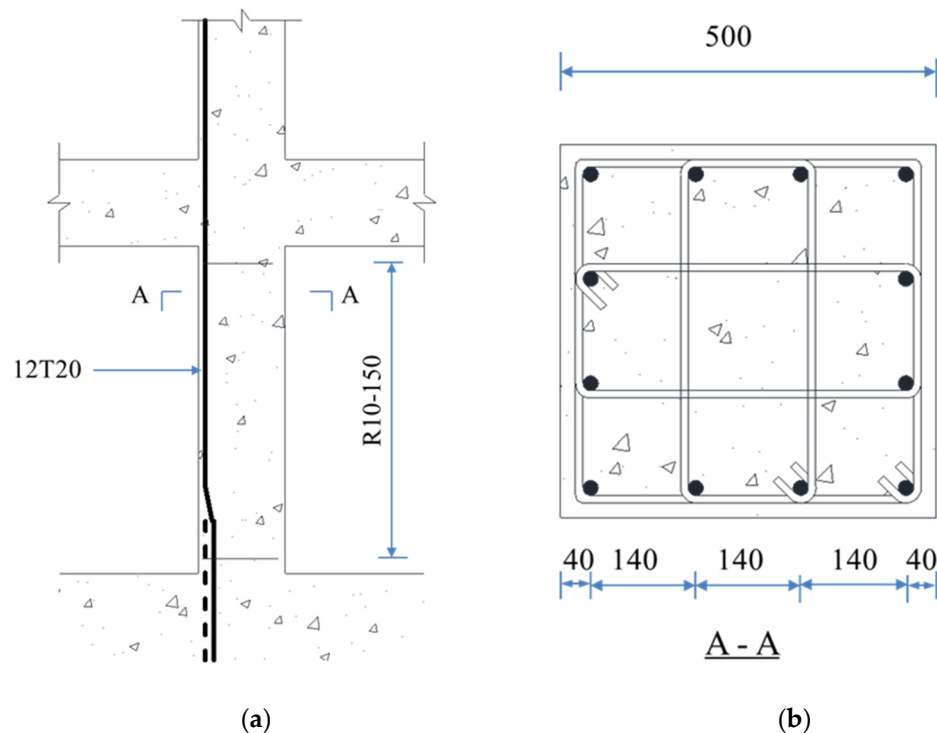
Reinforcement details of column: (a) front view; (b) plane view.
